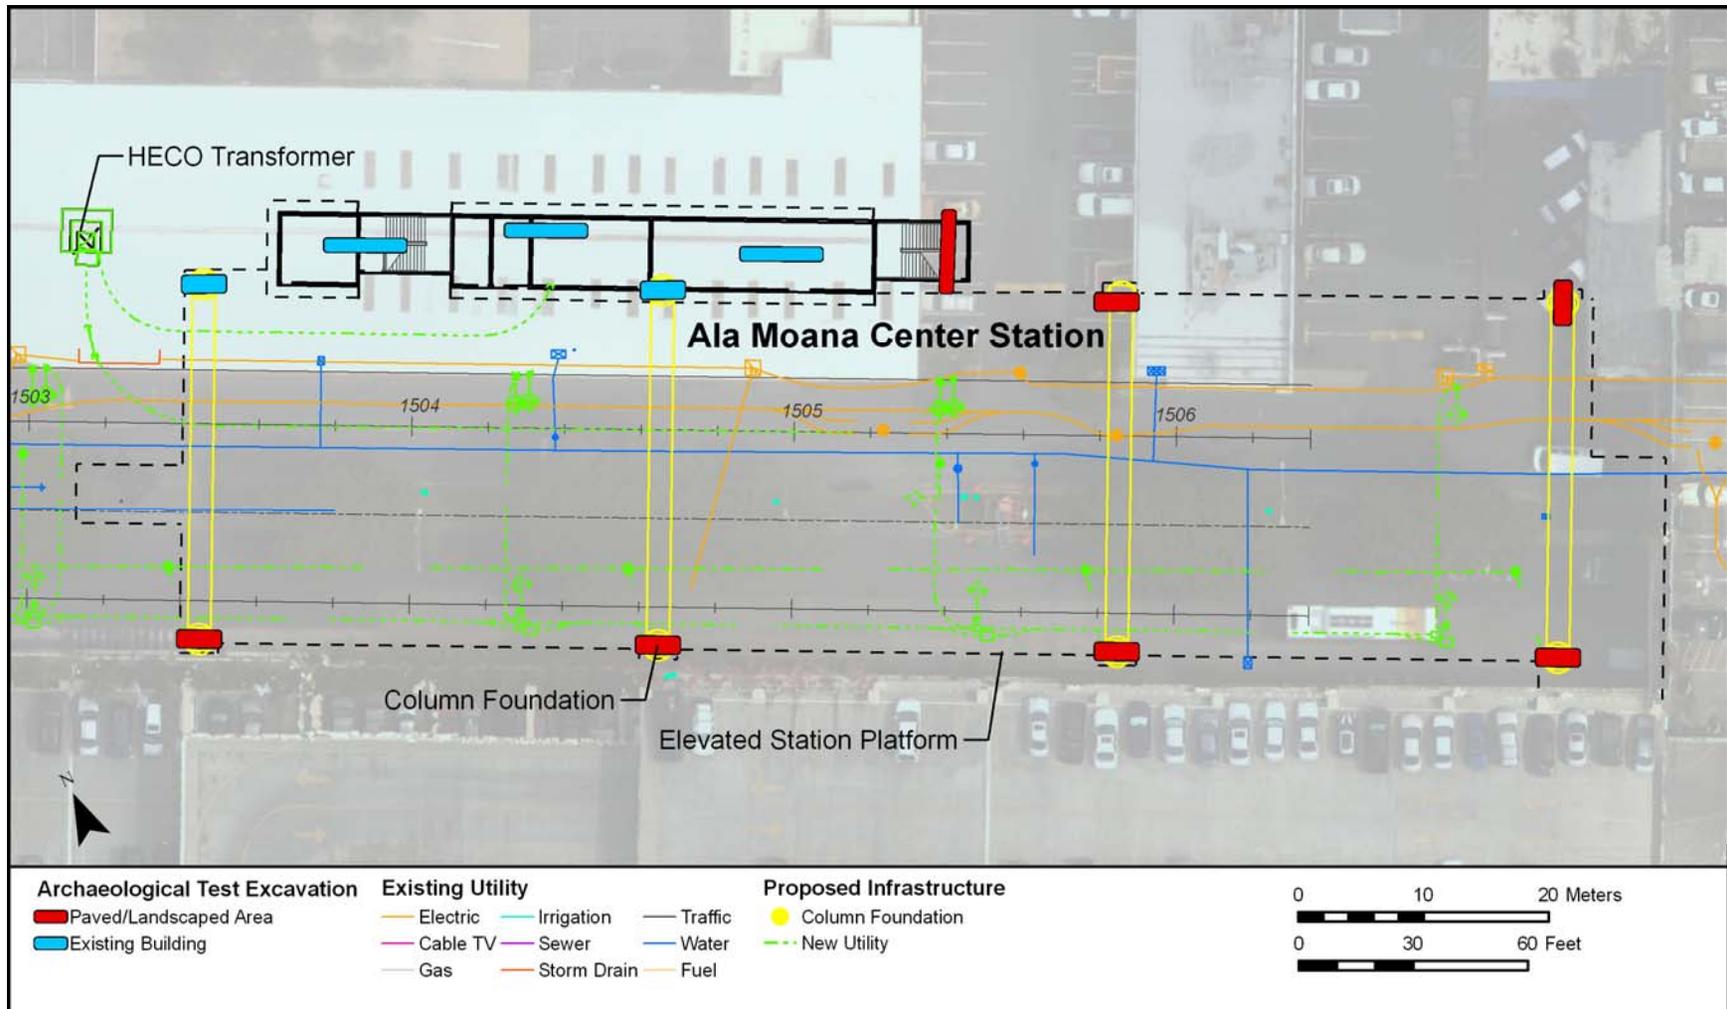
Ala Moana Center Station, detail of column foundation layout showing proposed locations for archaeological inventory survey testing (test all eight station column foundations with 3' by 10' excavations)
